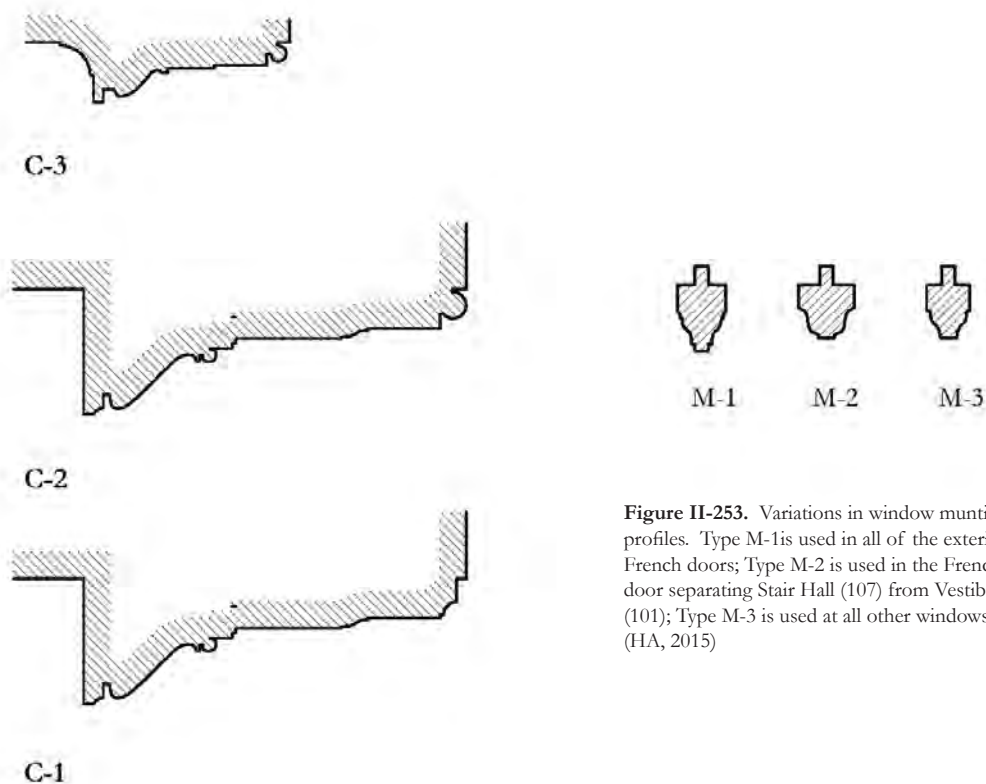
Variations in window muntin profiles. Type M-1 is used in all of the exterior French doors; Type M-2 is used in the French door separating Stair Hall (107) from Vestibule (101); Type M-3 is used at all other windows. (HA, 2015)
